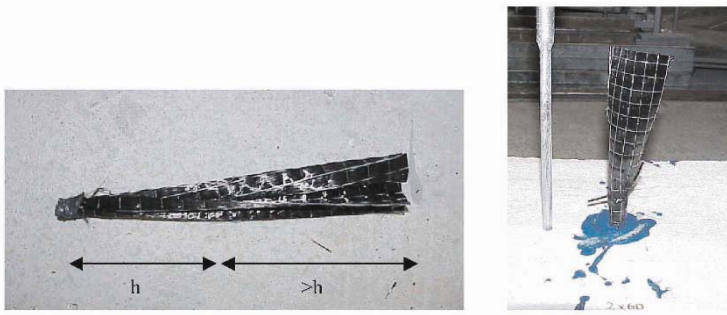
a) Rolled CFRP sheet (left) and b) CFRP anchor embedded into concrete (right)
